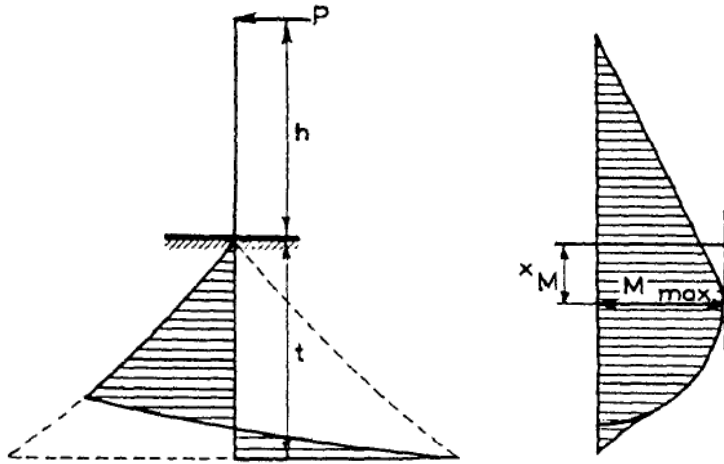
location of maximum bending moment in horizontally loaded pile in soil
